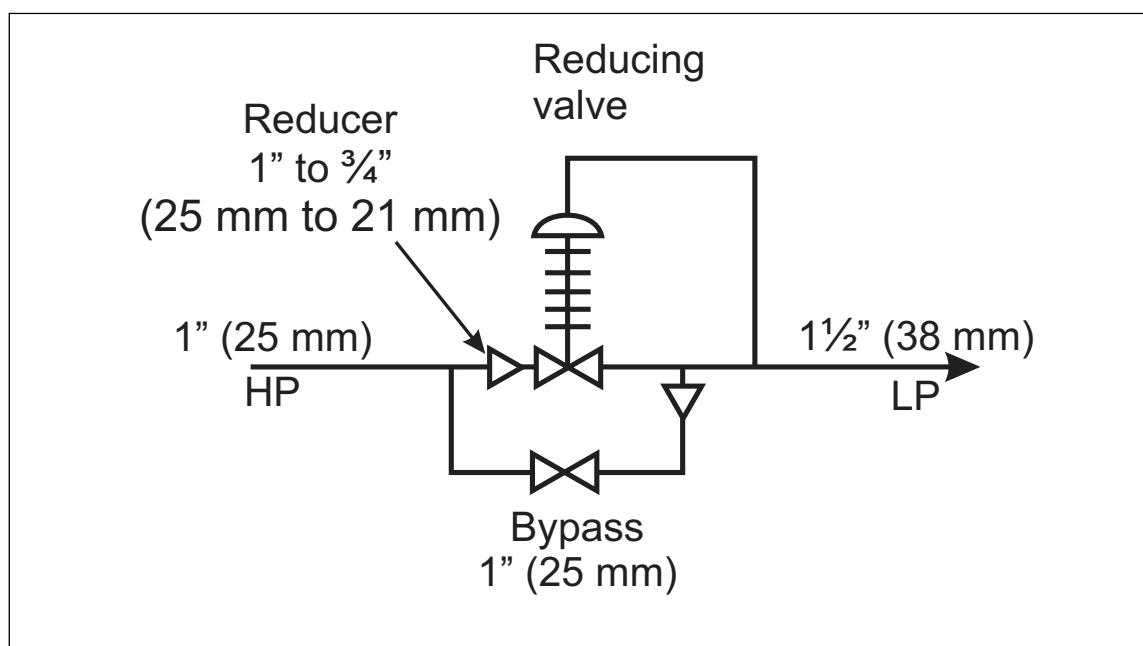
Bypass larger than reducing valve inlet
